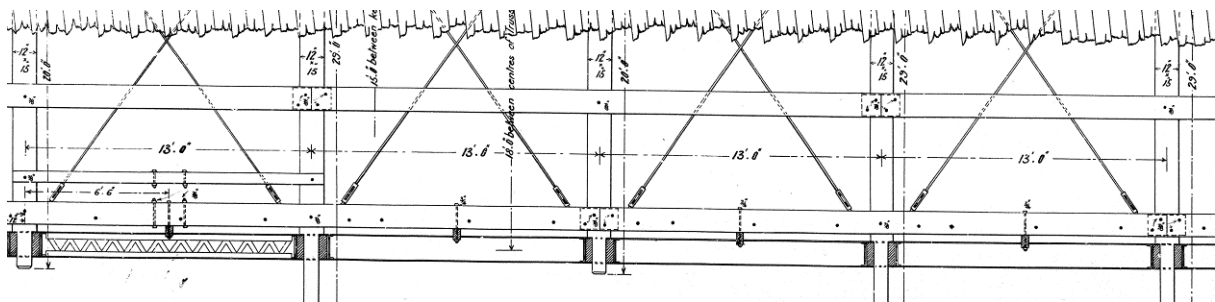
Layout of Timber Stringers and Transverse Decking on Typical de Burgh Truss Span
